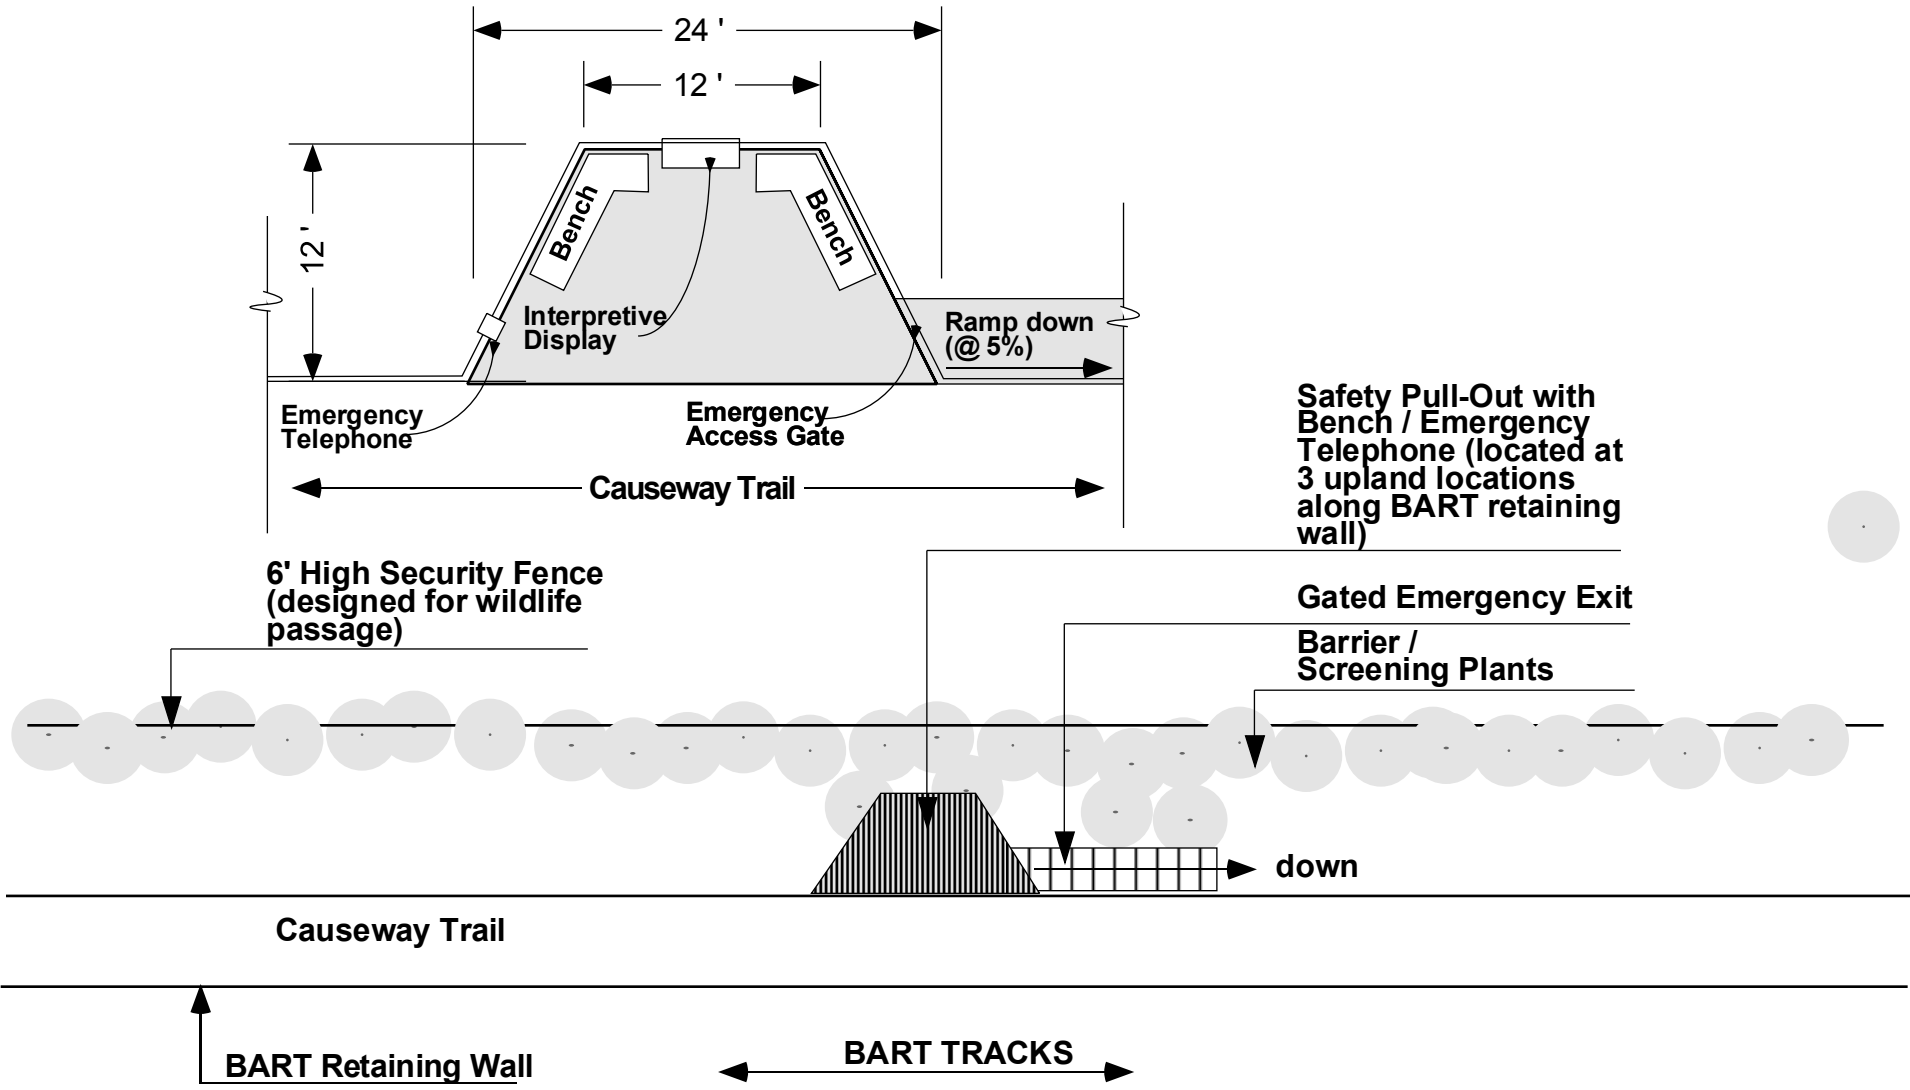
Trail Causeway adjacent to BART Retained Fill Section (Segment C2)
